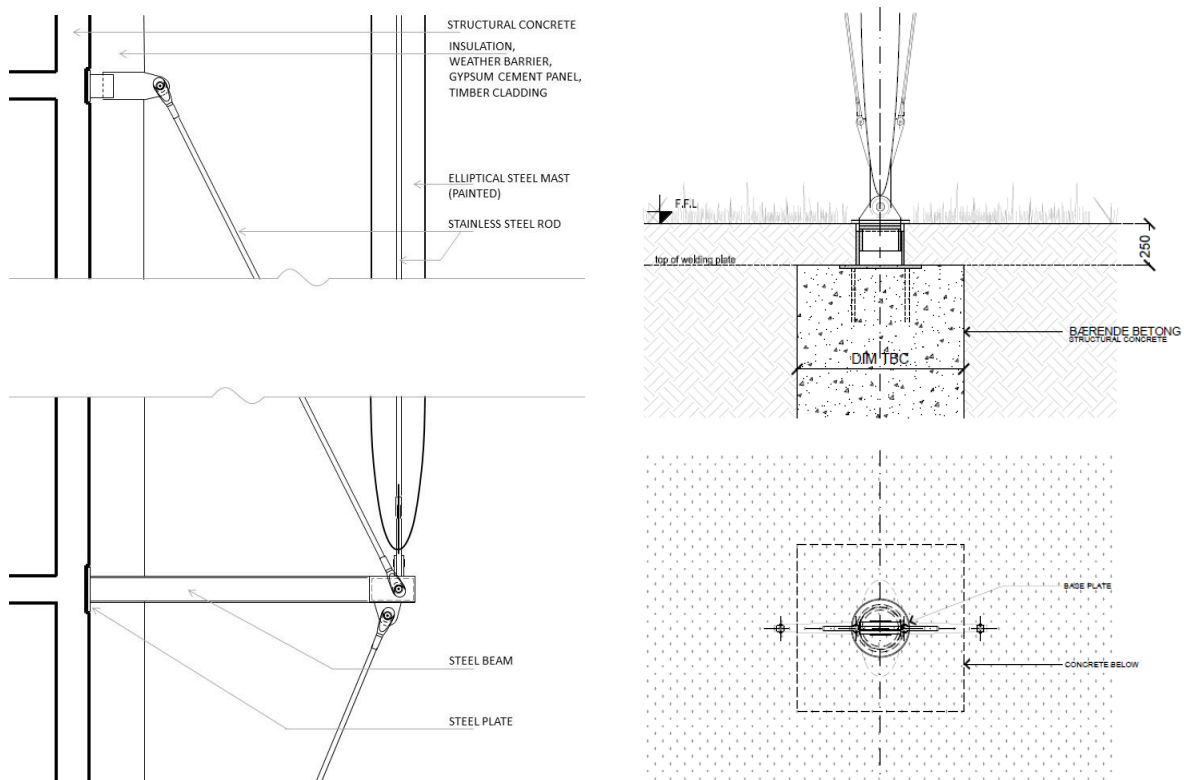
(a) Connection detailing of suspended masts in the Astrup Fearnley Museum (b) Connection detailing at the base (The diagram was redrawn to emphasize only the essential features of stayed masts using the drawings provided by RPBW)
